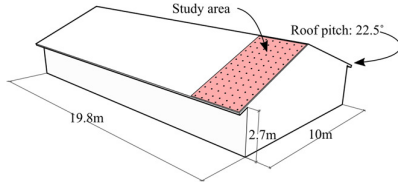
Study area of the wind tunnel model with full-scale dimensions
